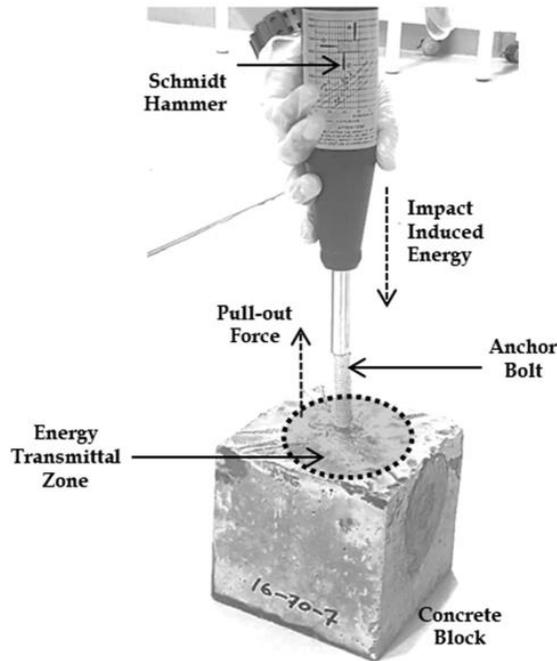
A View of the mechanism used for testing the cube specimens [5].
